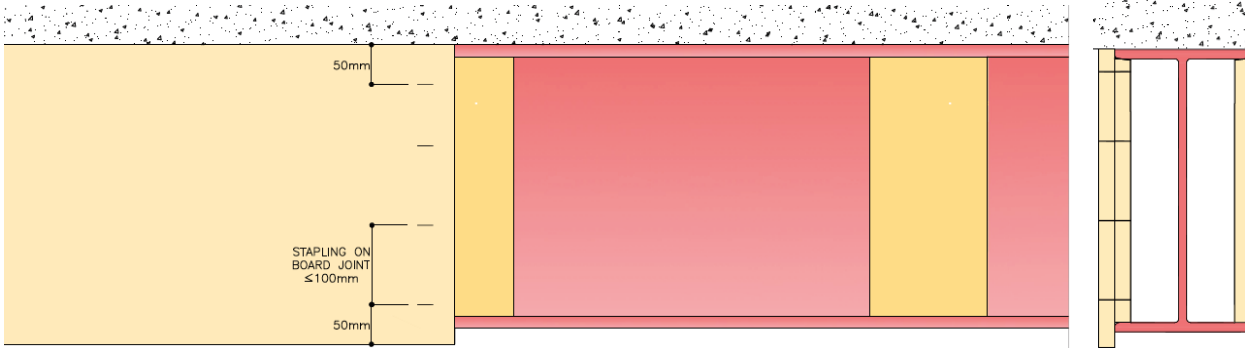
Elevation and cross-section view of Universal Steel Beam, showing fixing of Knauf Fireboard
